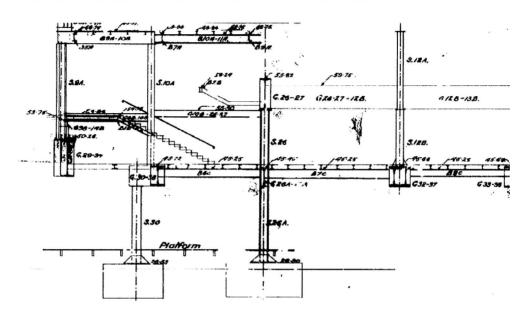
Archive drawing Metropolitan Railway Kings Cross Reconstruction Cross Sections. Contract Drawing No.4. SECTION CC
